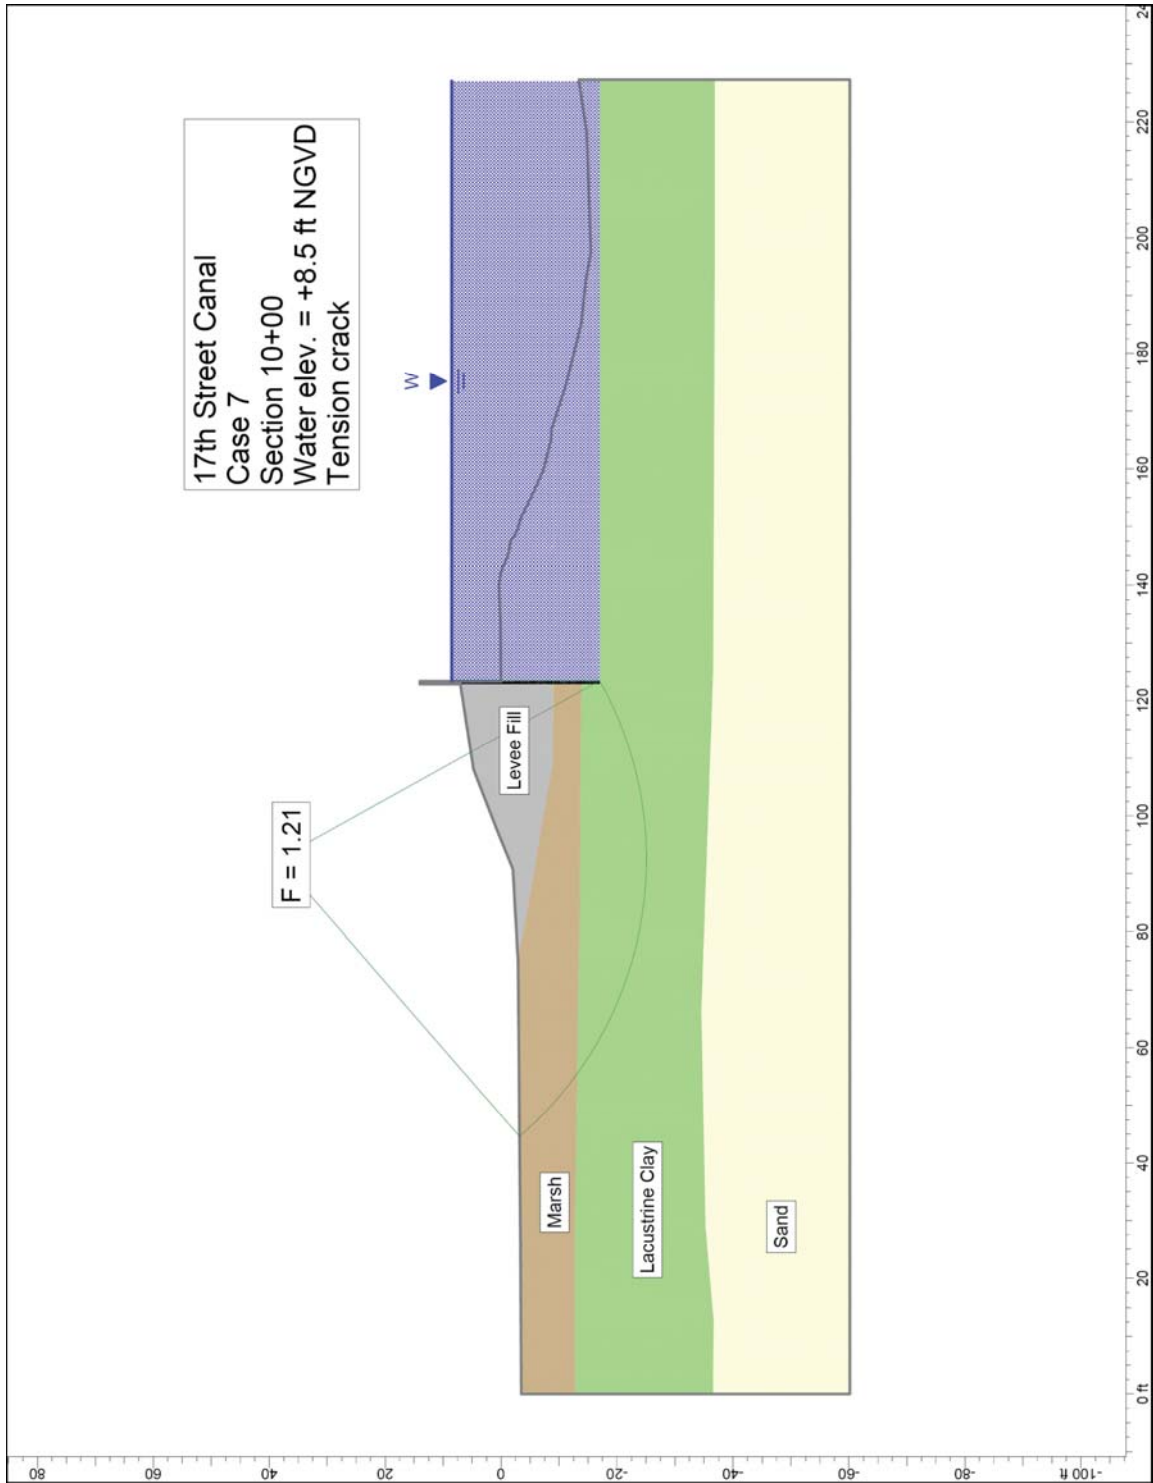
Critical circle for 17th Street Canal Station 10+00 – water elevation 8.5 ft, tension crack.
